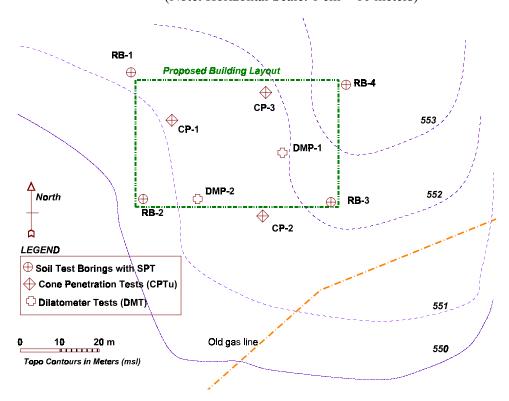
Plan Showing Proposed Boring and In-Situ Test Locations.
